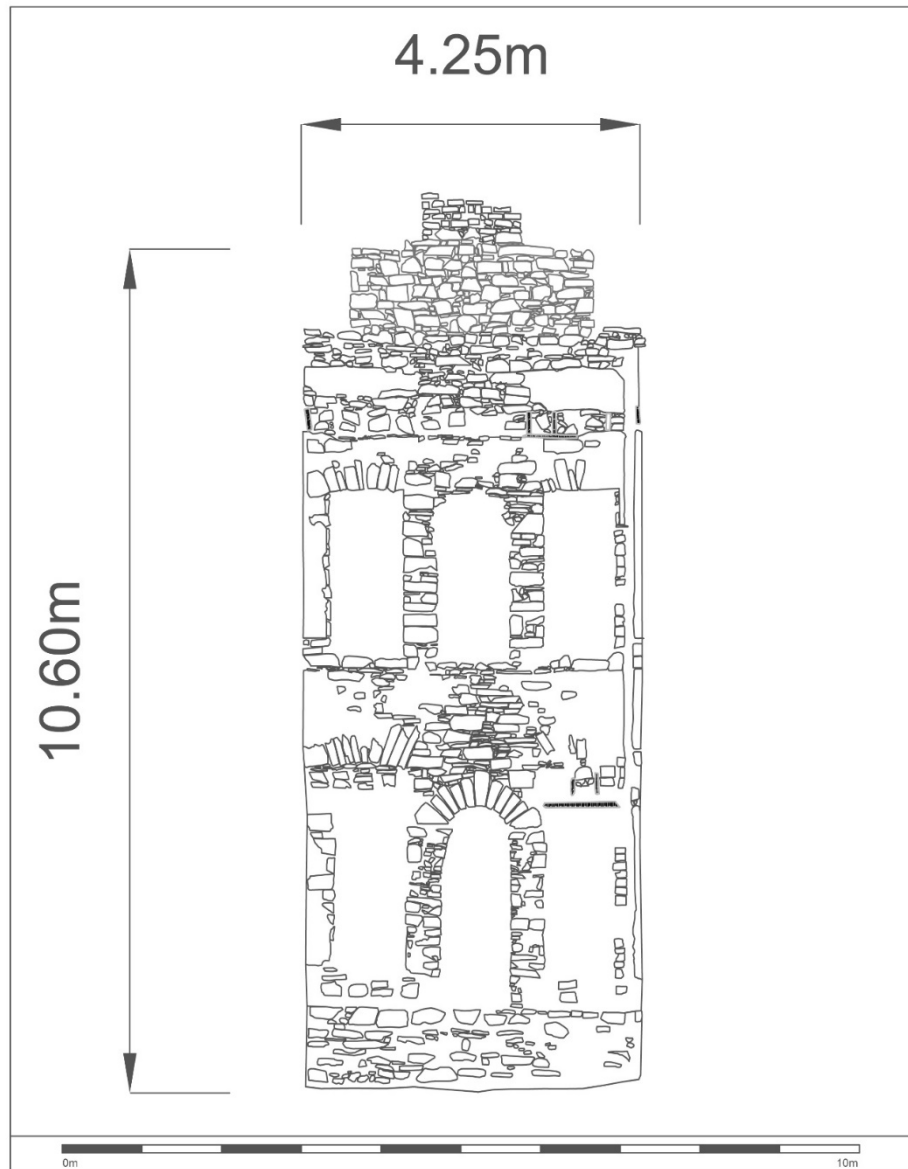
Internal elevation of the south-east wall of the signal tower at Crohy Head Signal Tower.
